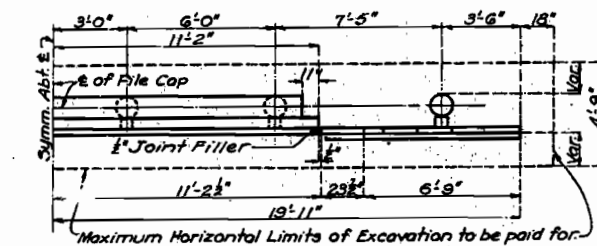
DETAIL OF INTERIOR BENT NO. 4 REQUIRING DOUBLE BRACING
